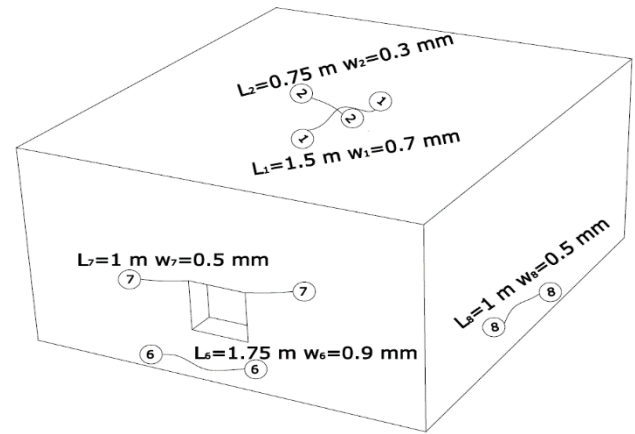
Sketch of cracks in the reinforced concrete room (rear view)
